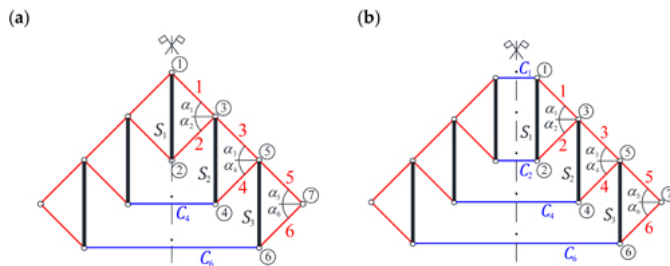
Geiger truss type: (a) A-2 and (b) B-2.* ↩
